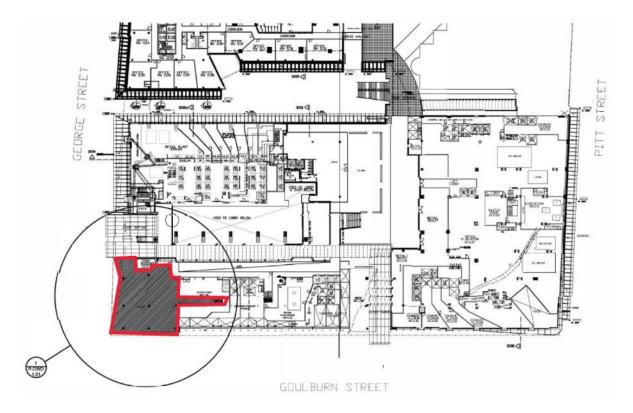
Location Plan - Level 11, tenancy 11.05 outlined in red.
